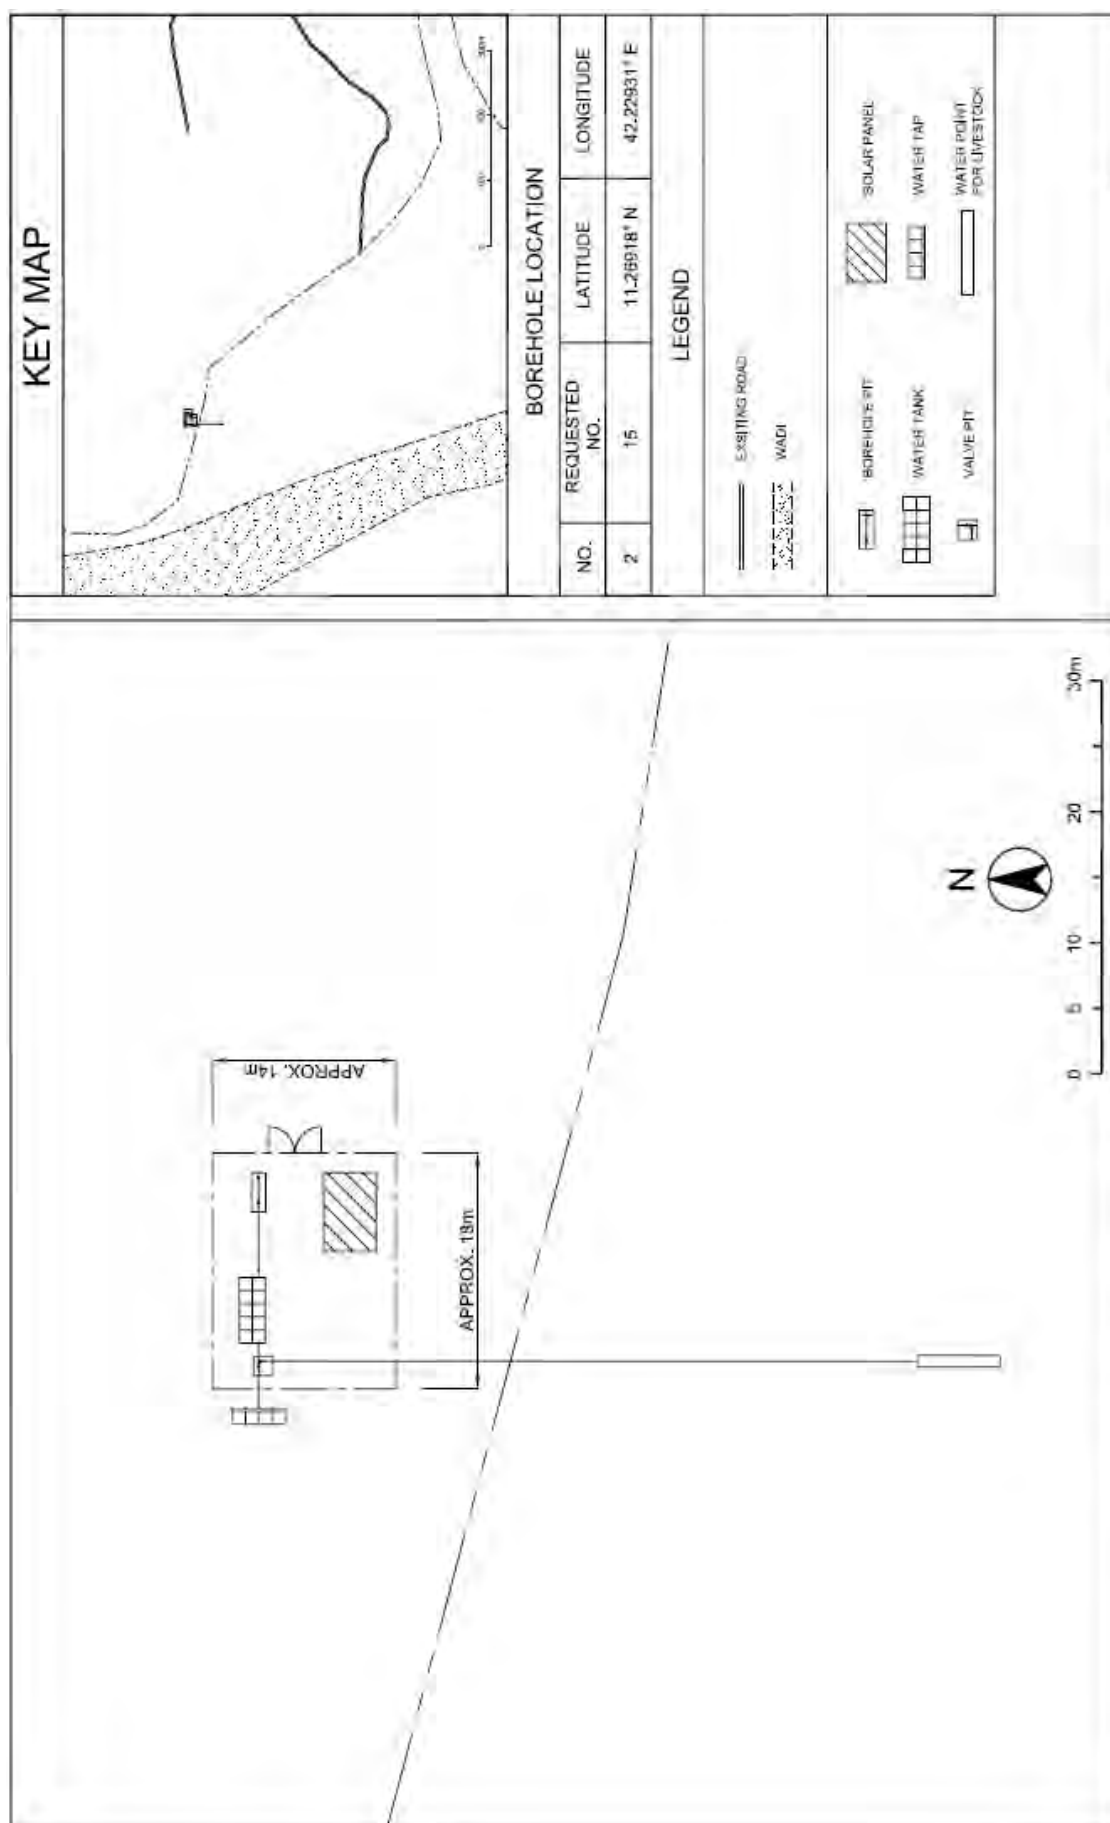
Layout of Facility (4) [Sek Sabir]
